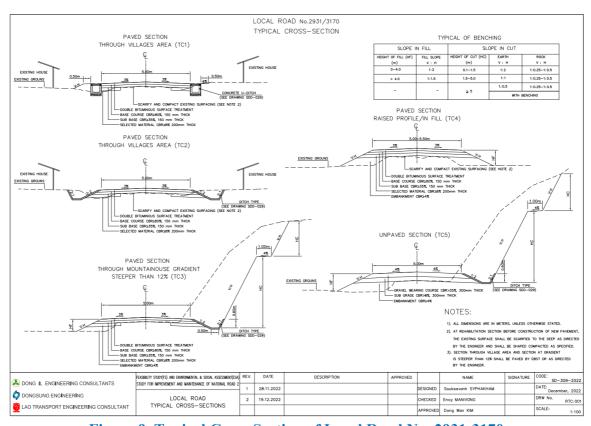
Typical Cross Section of Local Road No. 2931-3170
